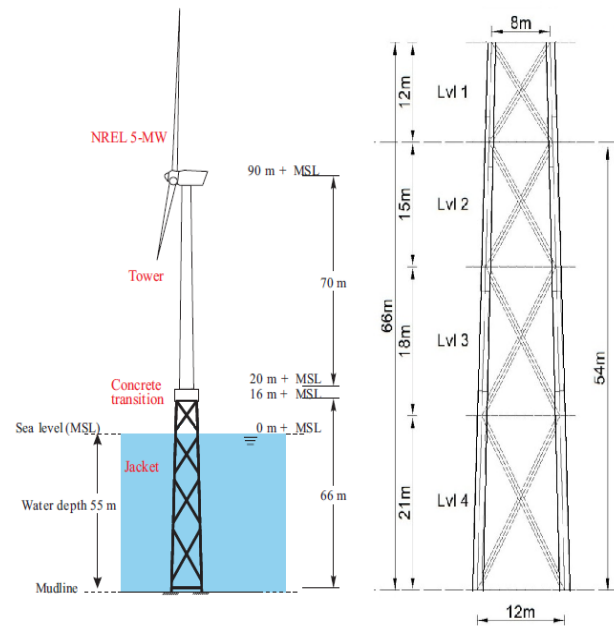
An overview of the semi-submerged truss support tower of an oceanic wind power plant (Ref. 37)
